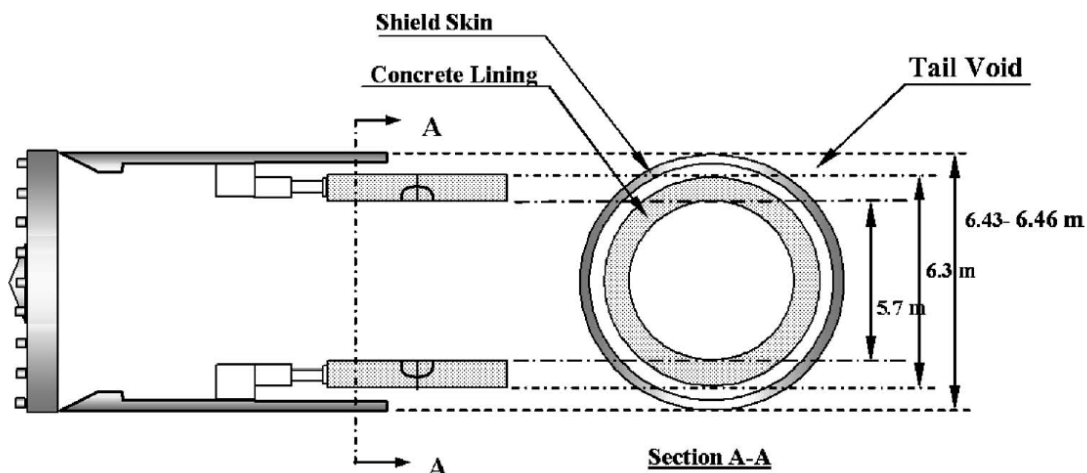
Tail void between the concrete lining and the excavated surface (Suwansawat & Einstein, 2007)
